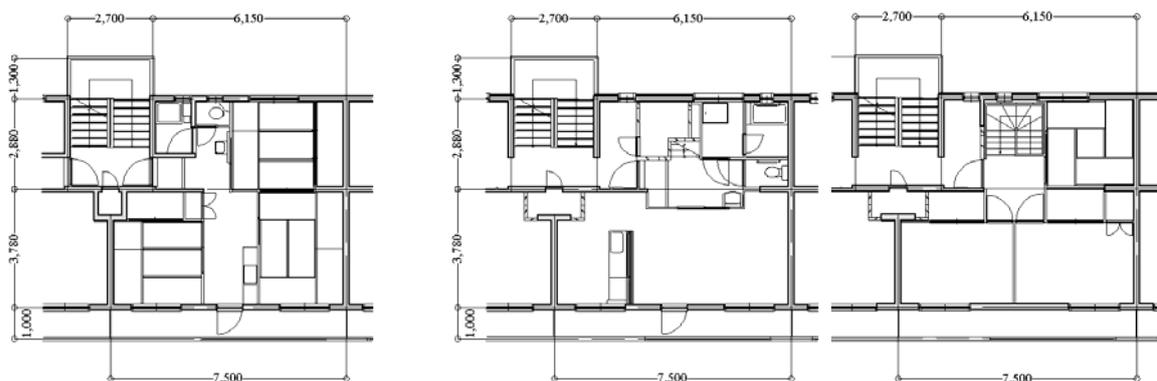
Dwelling Units Plans Before and After Flats into Duplex, Original Dwelling Unit Plan, Lower Floor Plan and Upper Floor Plan of Duplex
